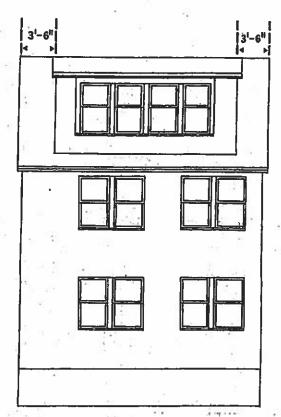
Shed-roof dormers should be setback no less than 3 ft. 6 in. from the gable end walls and 1 ft. 6 in. from the main walls underneath the saves.
